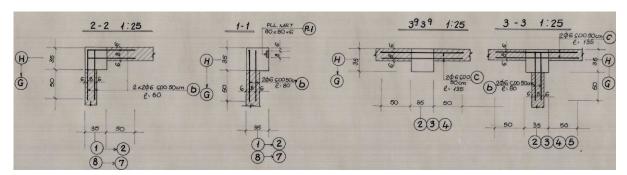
Connection details: prefabricated concrete column and masonry infill wall (source: AQTN, 1999).
